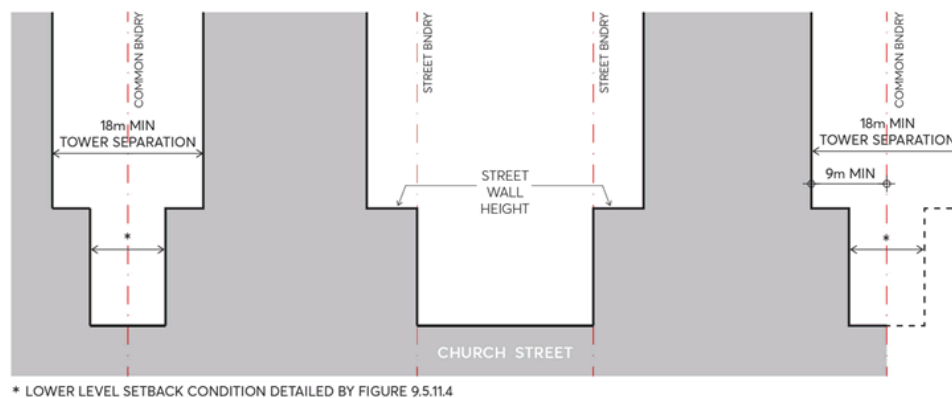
Tower separation between primarily east-west facing facades
